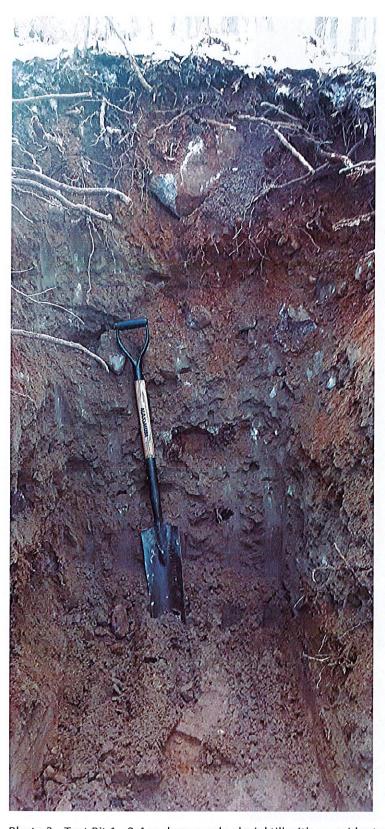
Test Pit 1 - 2.4 m deep sandy glacial till with no evident groundwater.
